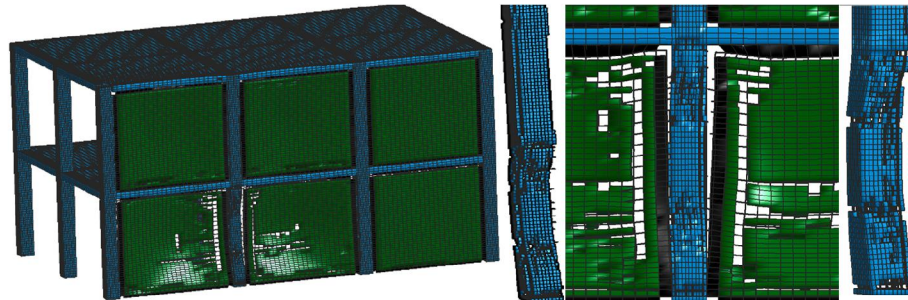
FE modelling for the building with different connection systems between protective wall and columns and slabs
